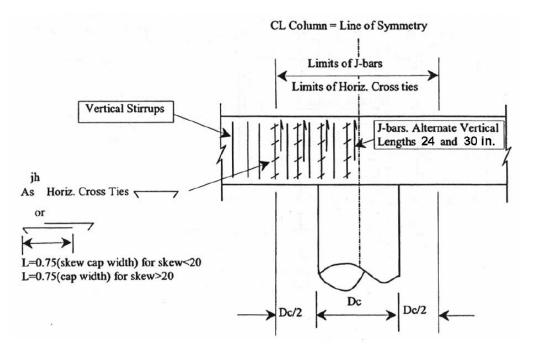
Location of Horizontal Joint Shear Reinforcement
